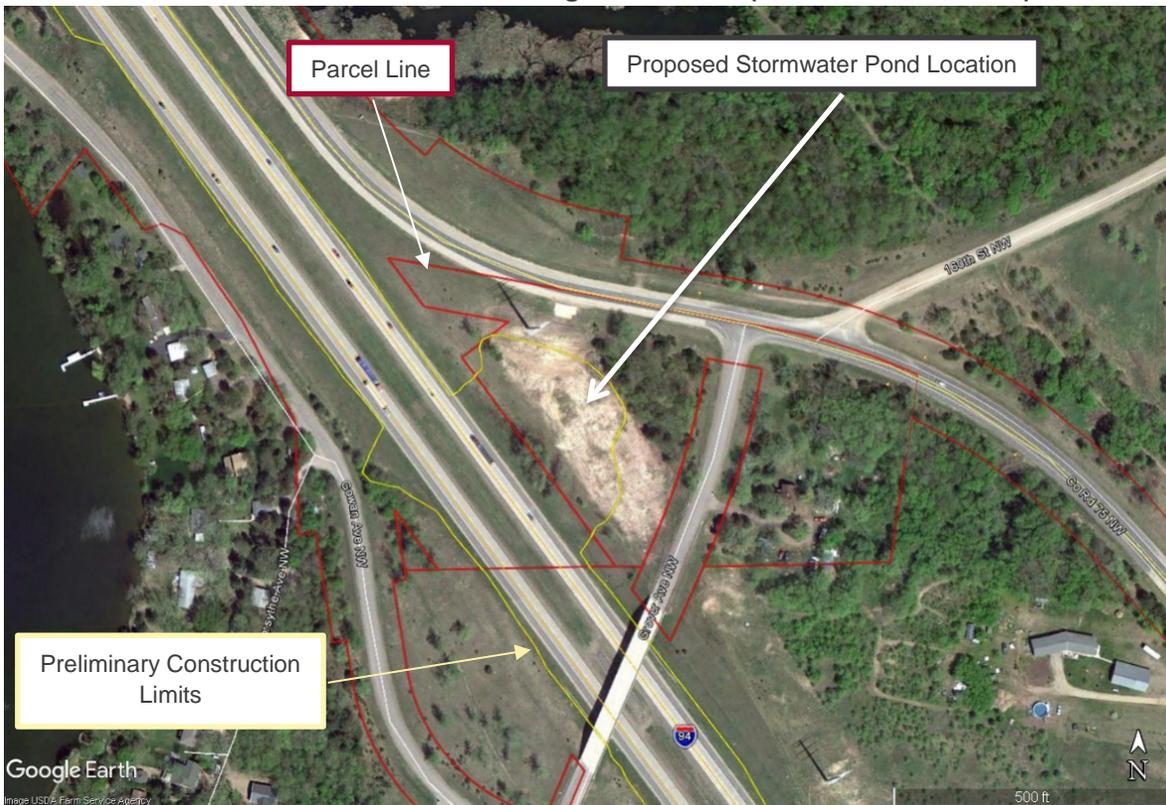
Pond 6 Location (Aerial Date 5-14-2018)
